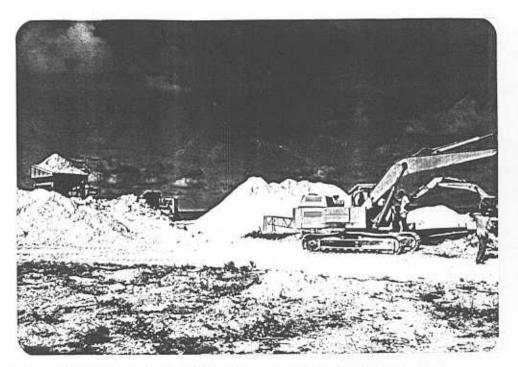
Sand and gravel material excavated from the lagoon reef flat.
